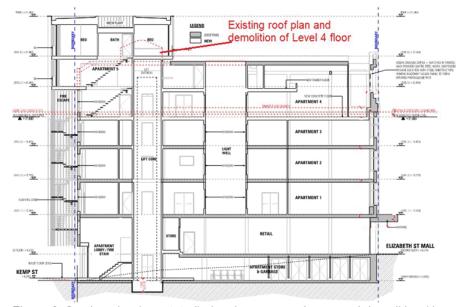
Section plan (annotated) showing proposed uses and demolition (Jaws, 2020)
